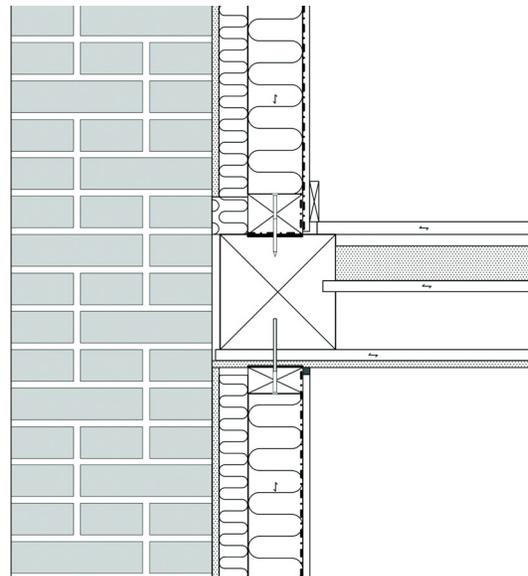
Vertical section of the joint between the horizontal division and the non-load-bearing house end after post-insulation.
